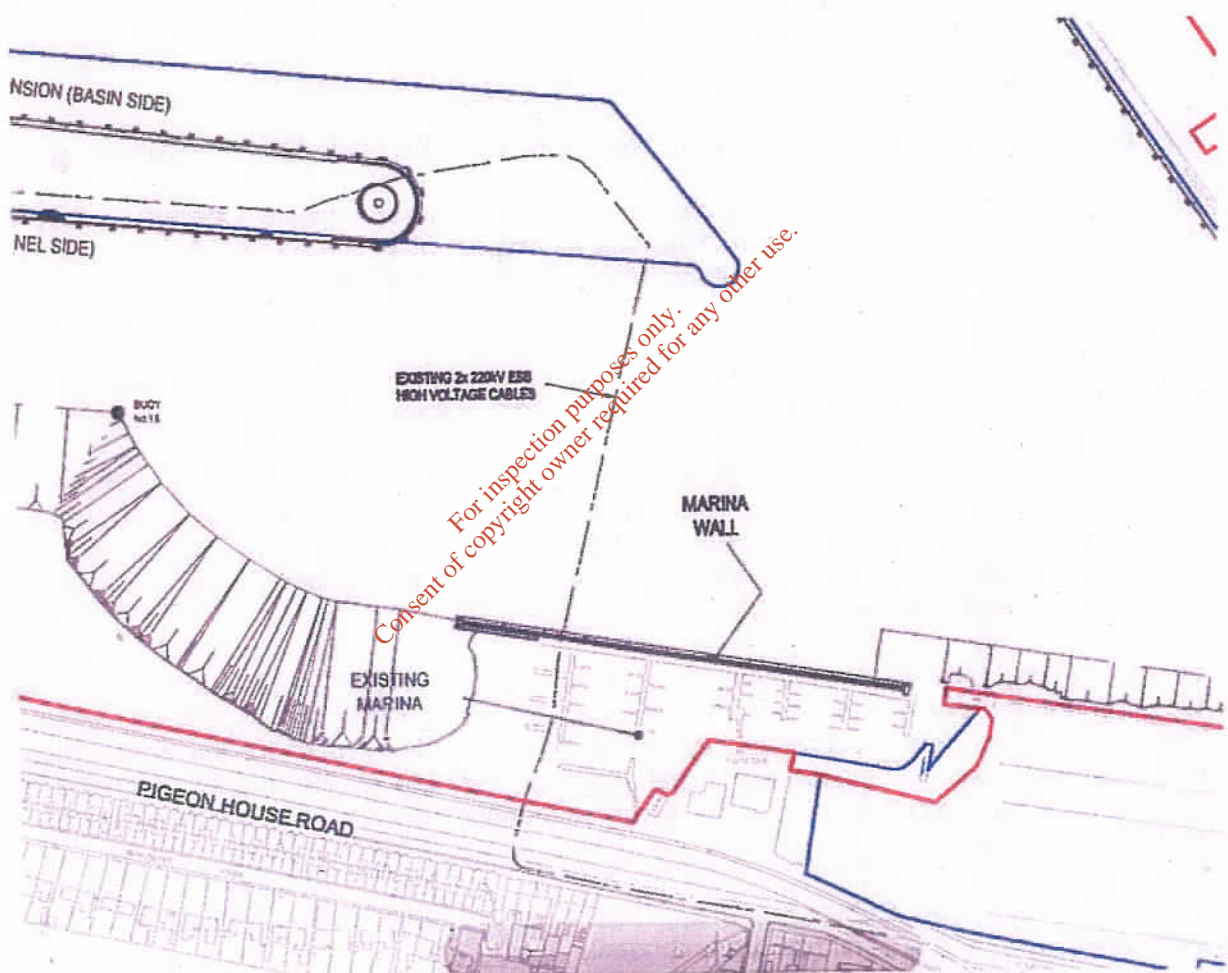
Extract 'Proposed Channel Layout Sheet 1' showing westernmost cable crossing
